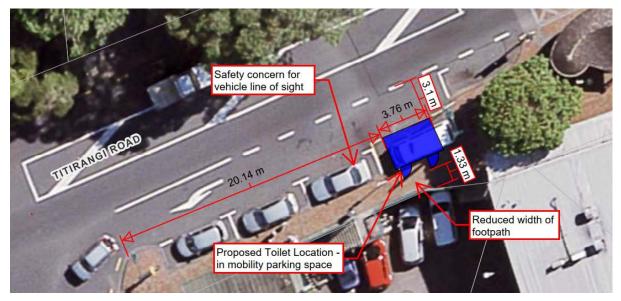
Road Corridor and Transport Implications of Toilet Facility (AC GeoMaps 2019)
